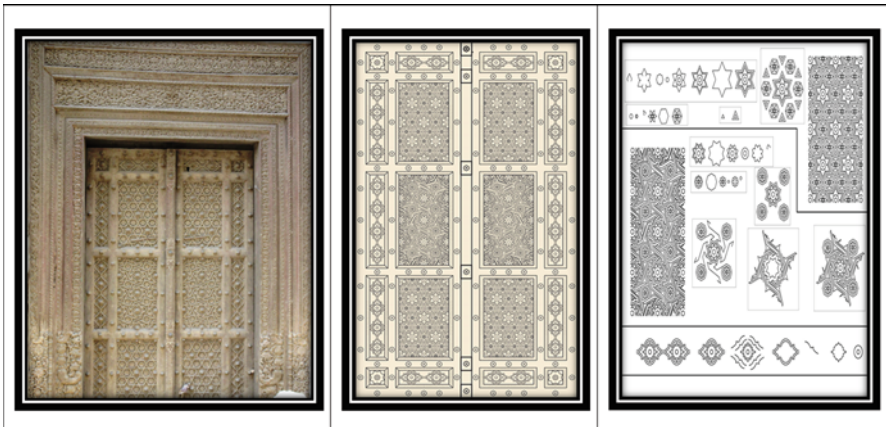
Wooden door of old *haveli* in *chhatta* Jambudas with layout and details (Source: Author)
